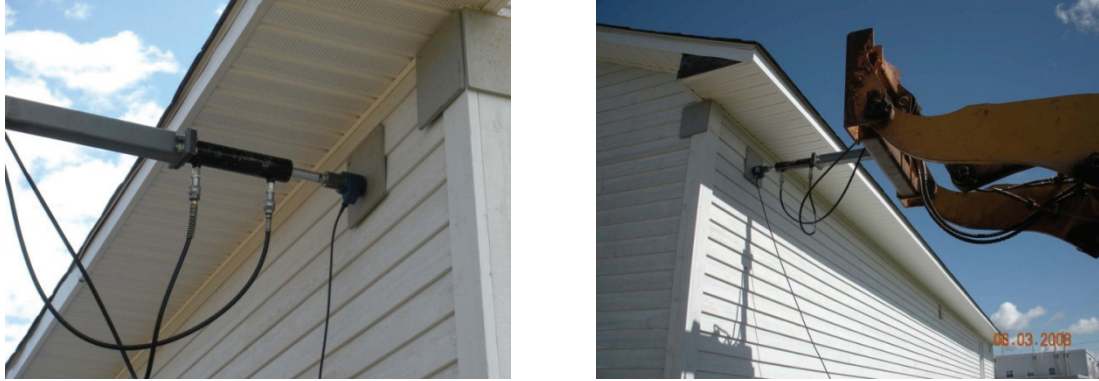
Application of static ramp load at the top of the North-West and South-East walls.
